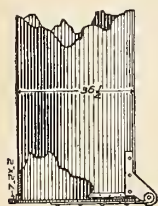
Sketch of valve for riveted-plate outflow culvert.
